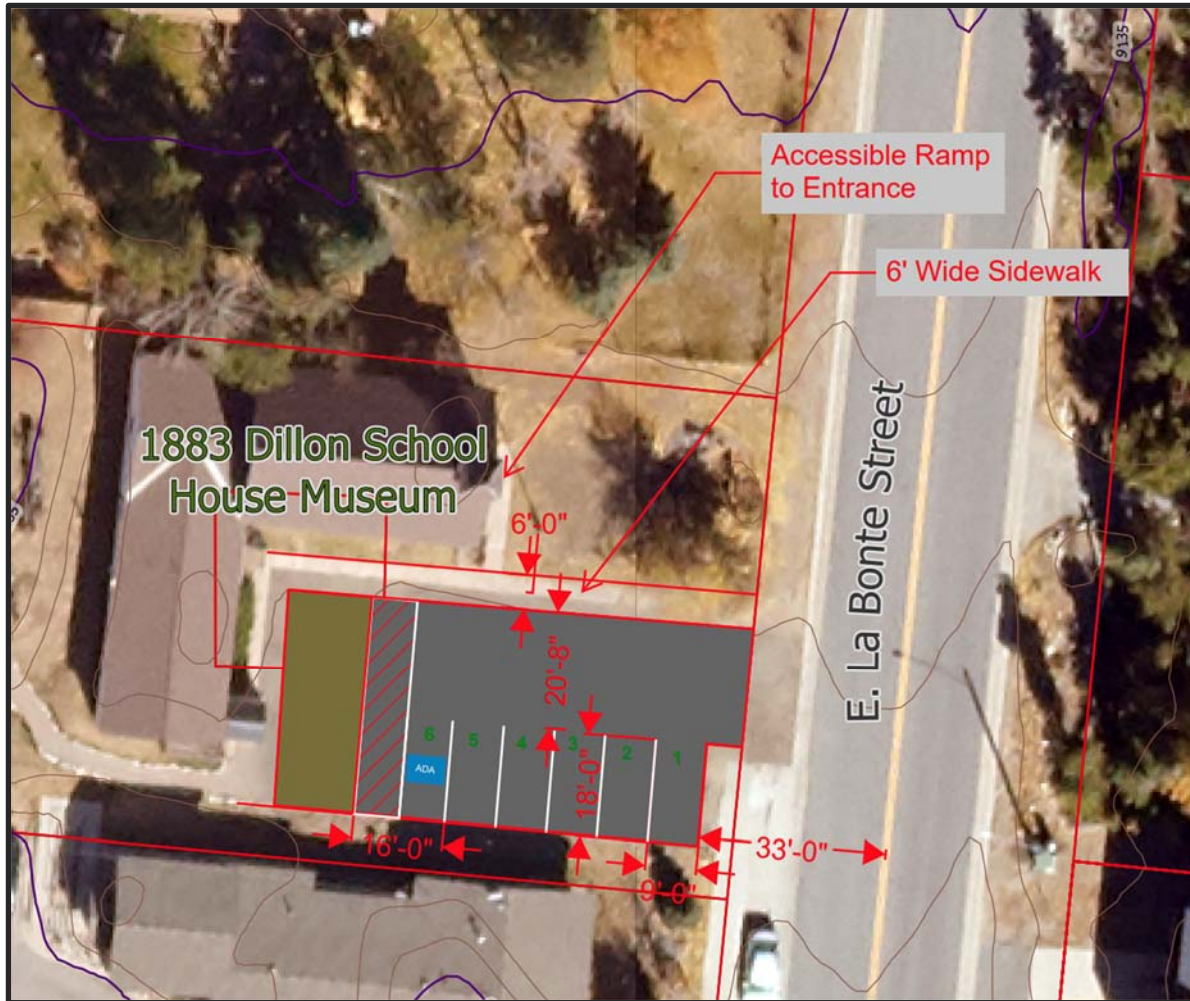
Potential 1883 Dillon School House Museum Parking Configuration
